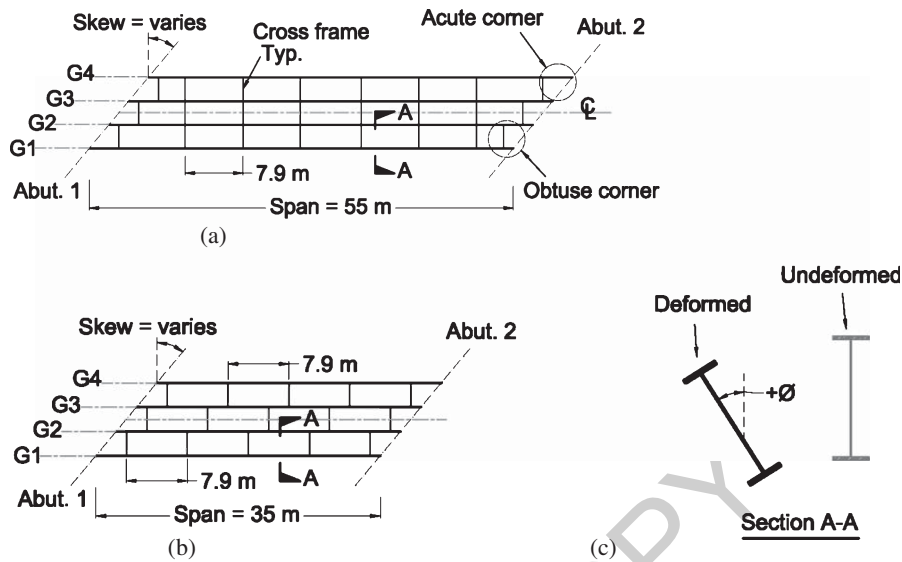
(a) Typical framing plan for span = 55 m; (b) typical framing plan for span = 35 m; (c) lateral girder deformation (out of plumb angle).
